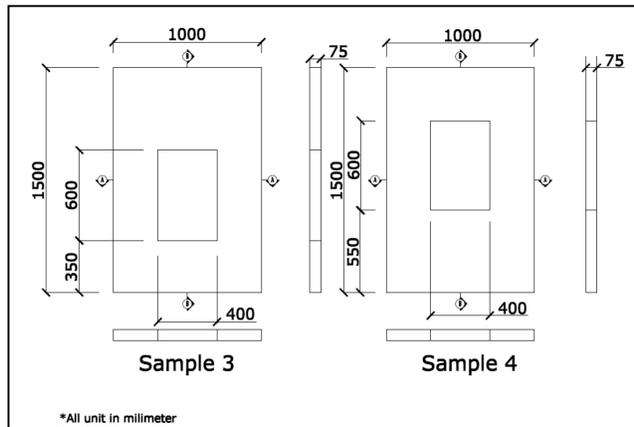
Details for unreinforced EPS-LWC wall panel samples.
